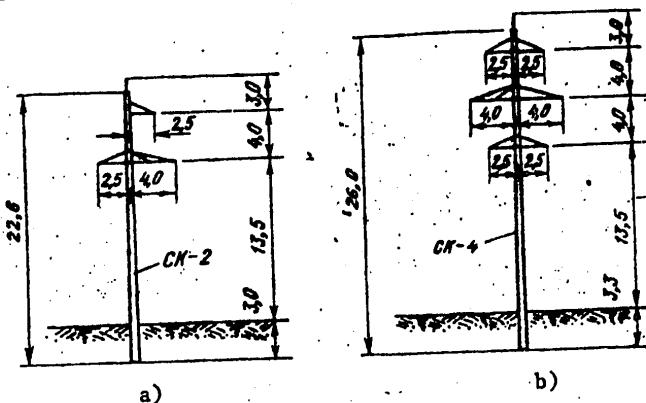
Standardized 150-kV Reinforced-concrete Towers
